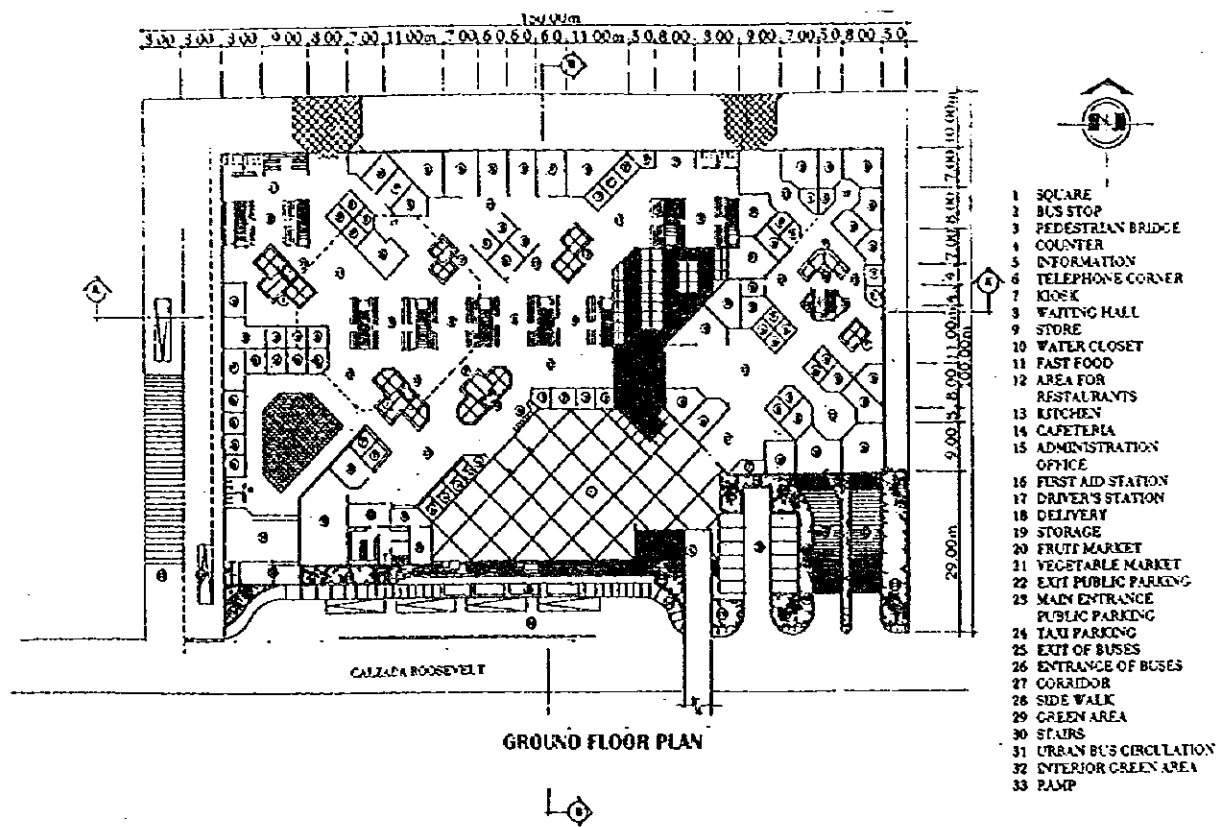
First Floor Plan of West Interregional Bus Terminal
